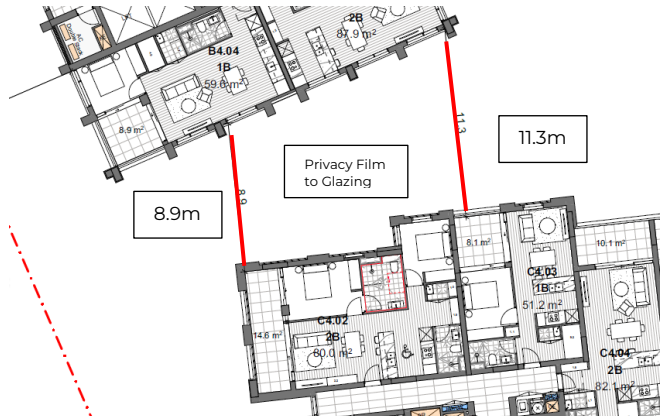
Building Separation Between Building 2.1 and Building 2.2 above Level 3
